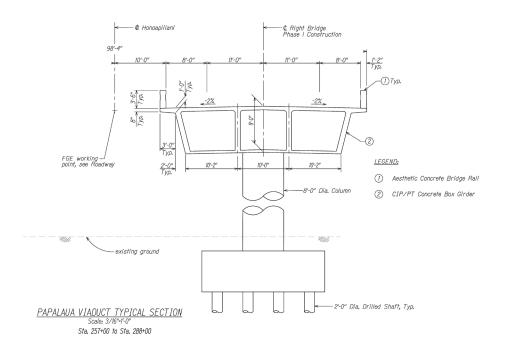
Typical Long Span Bridge Elevation and Section
